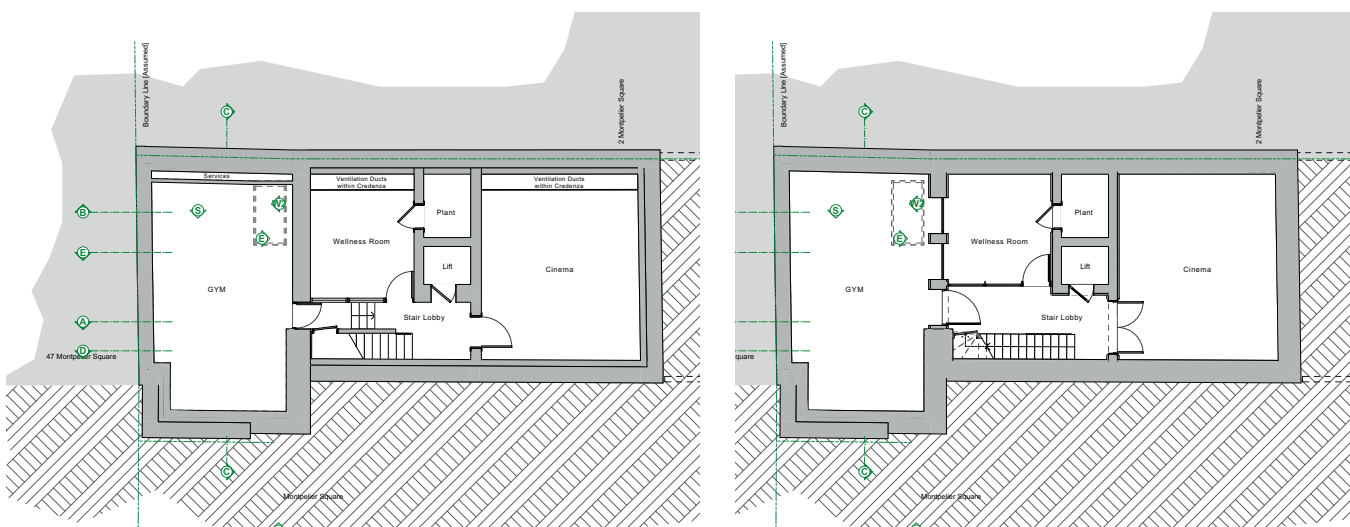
Approved (left hand side) and proposed (right hand side) basement floor plan
